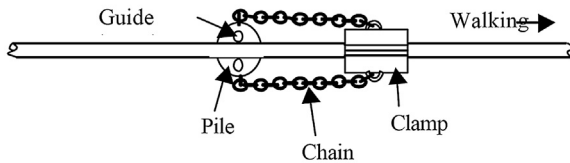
Flowline expansion system with an anchor to control walking.
